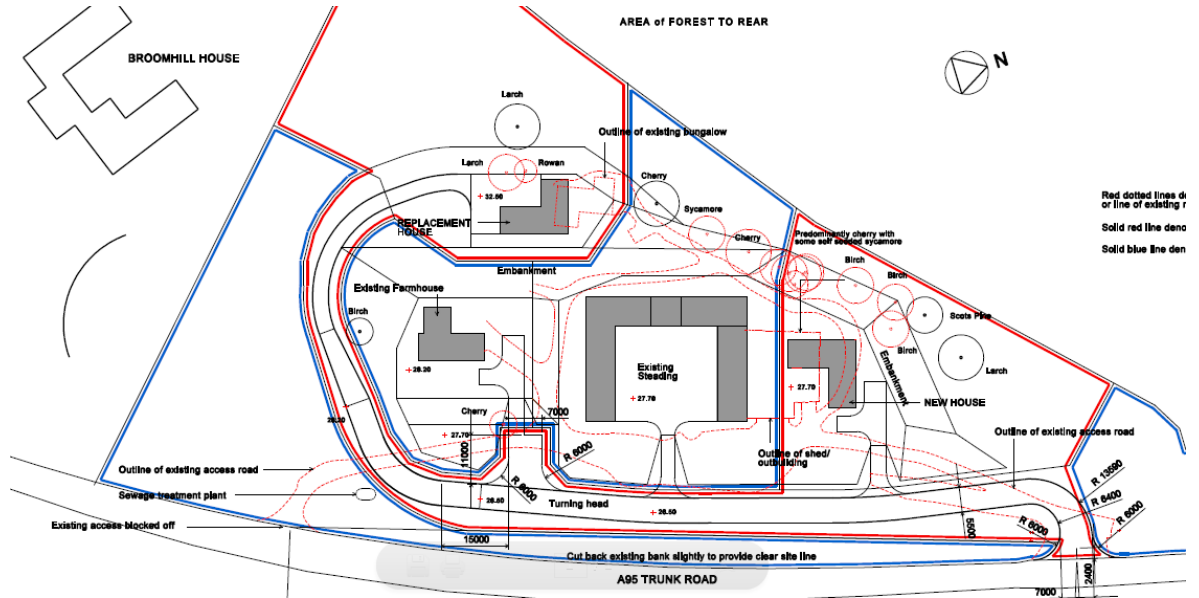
Layout Plan (Extract from applicant's location plan for information only)
